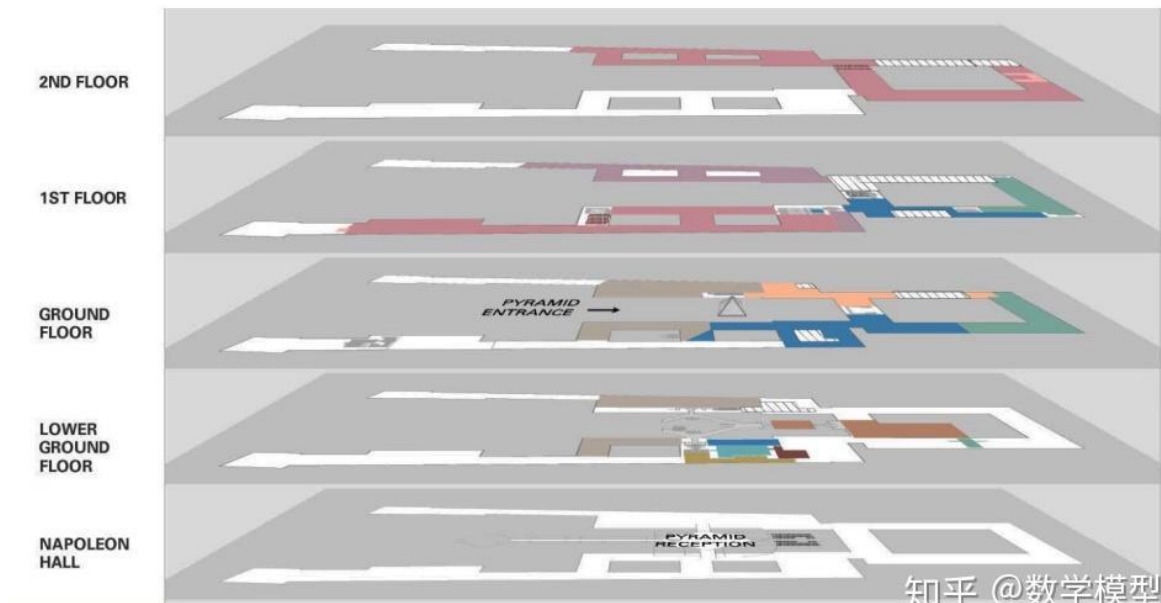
Floor plan of Louvre<sup>[3]</sup>
